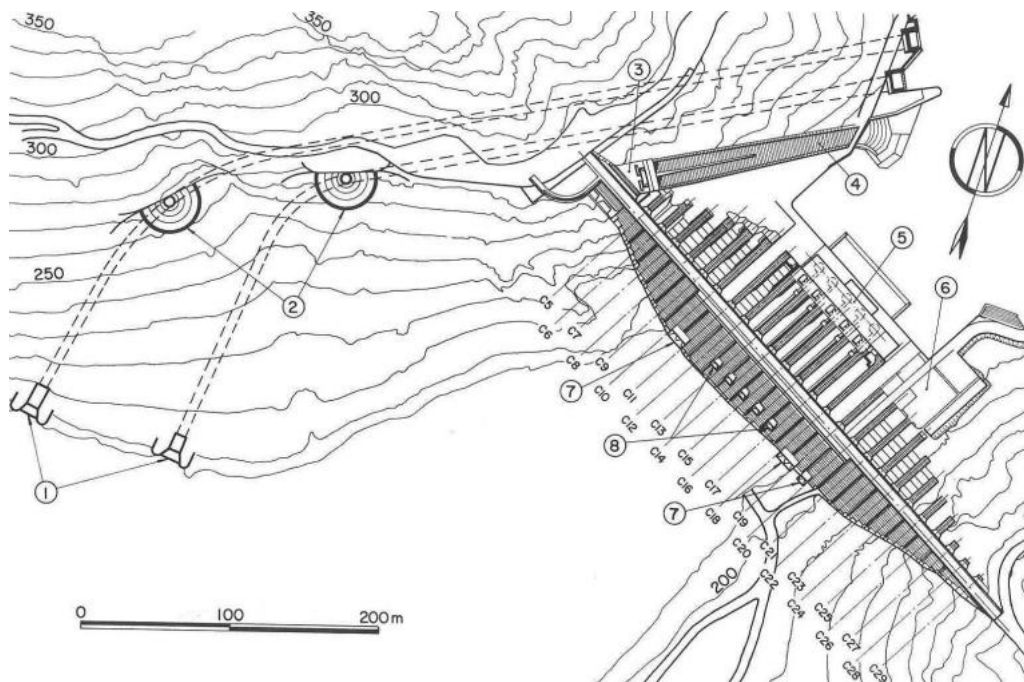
Layout of Sefid Rud dam: (1) Intakes for diversion tunnels, (2) Morning glory spillways connected to diversion tunnels, (3) Orifice spillways, (4) Chute of intermediate spillway, (5) Powerhouse, (6) Switchyard platform, (7) Bottom and irrigation outlets left and right bank, (8) Intakes for penstocks [2]
